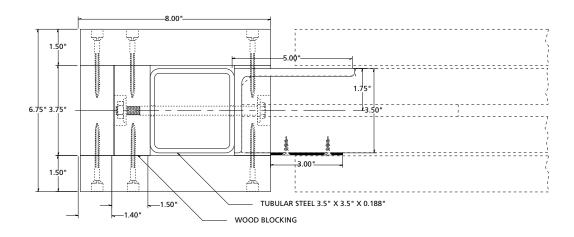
/2 x 3-1/2" x 3/16" POST ASSEMBLY PLAN VIEW
